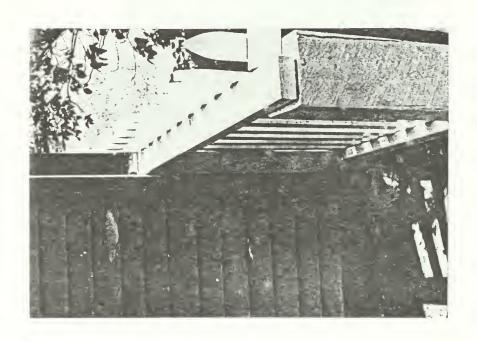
West India Goods Store, west end of north elevation, showing fence at northwest corner.
